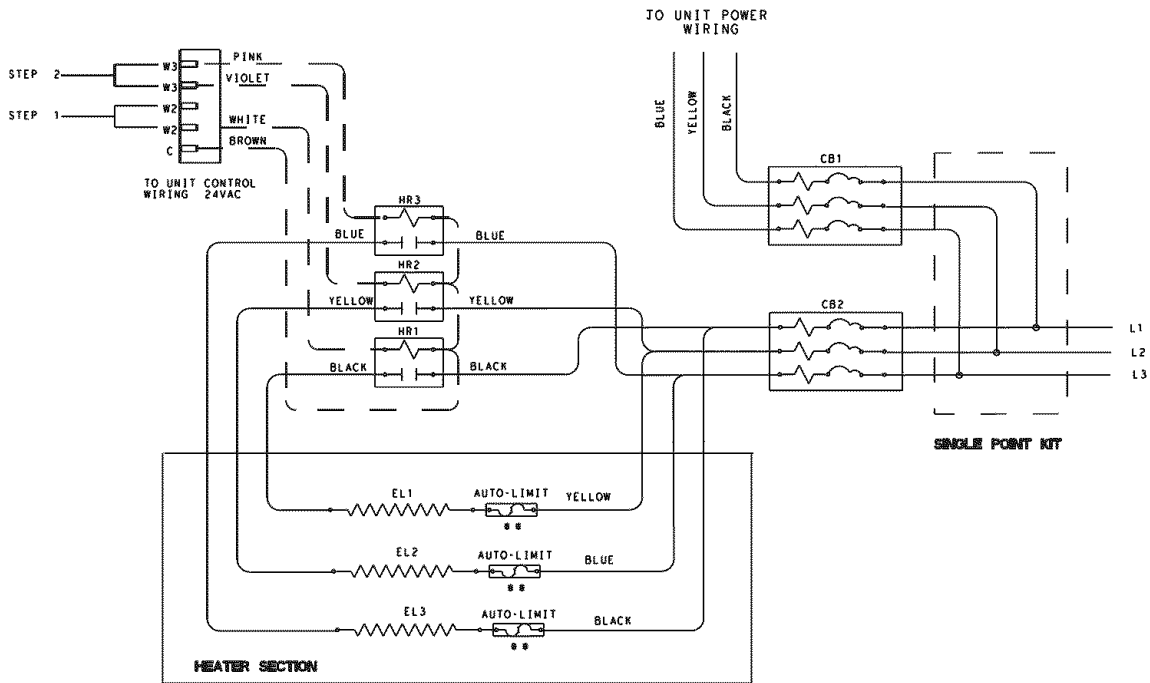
Three-Phase Accessory Electric Heater Wiring
